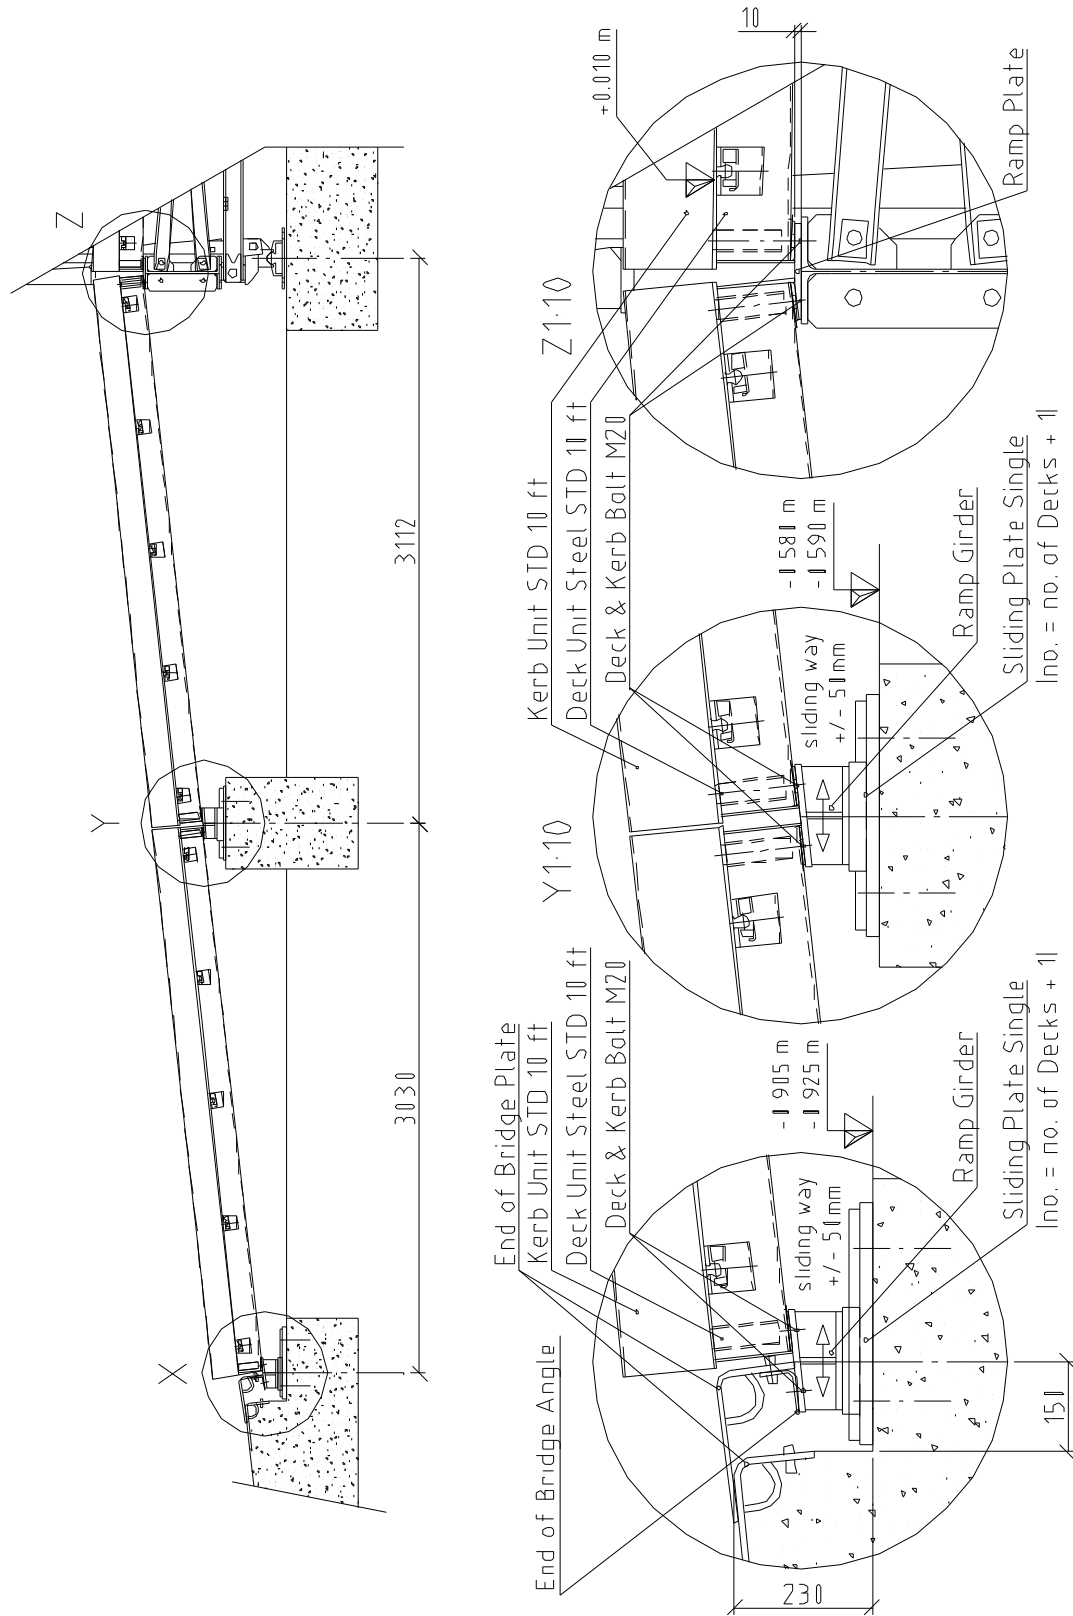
RAMP WITH CONCRETE FOUNDATION
